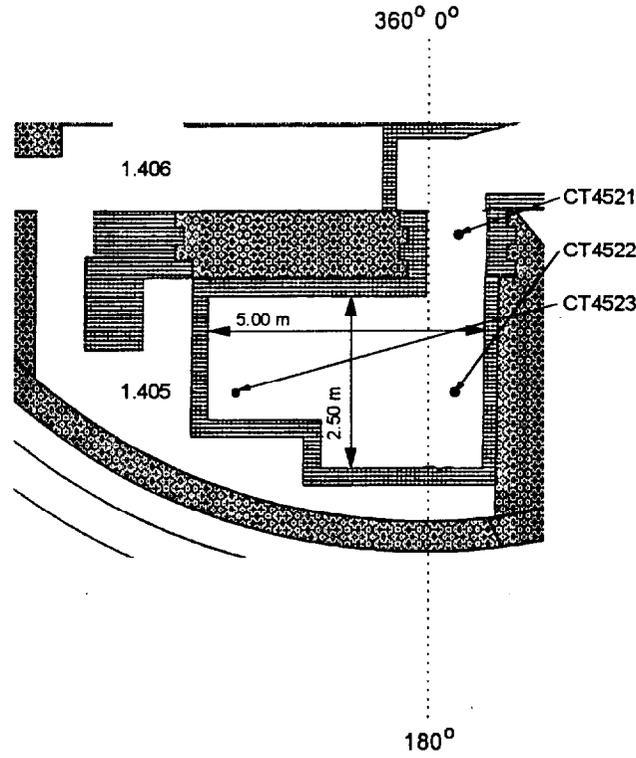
Fire Room at the +0.2 m Elevation for T51.1
